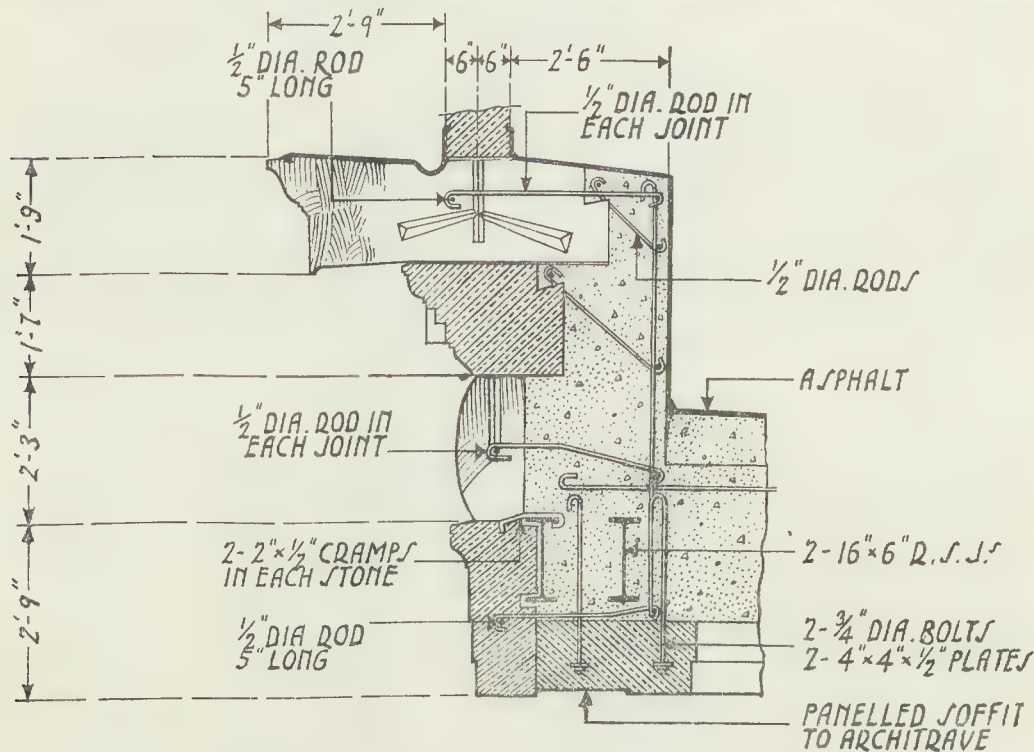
SECTION THROUGH AN ENTABLATURE ATTACHED TO REINFORCED CONCRETE
